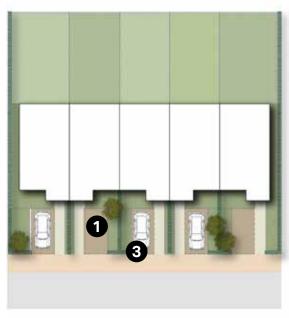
An illustrative diagram showing an indicative layout of on-plot front parking.
